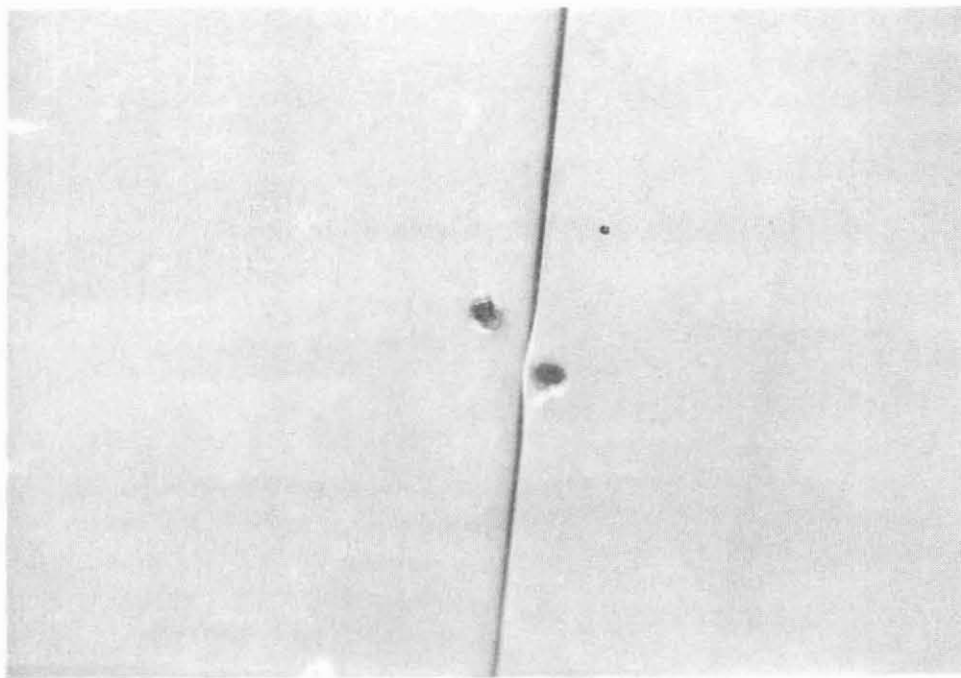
Partition Test Specimen P5: Typical Damage @ Screw Location @ Vertical Joint
